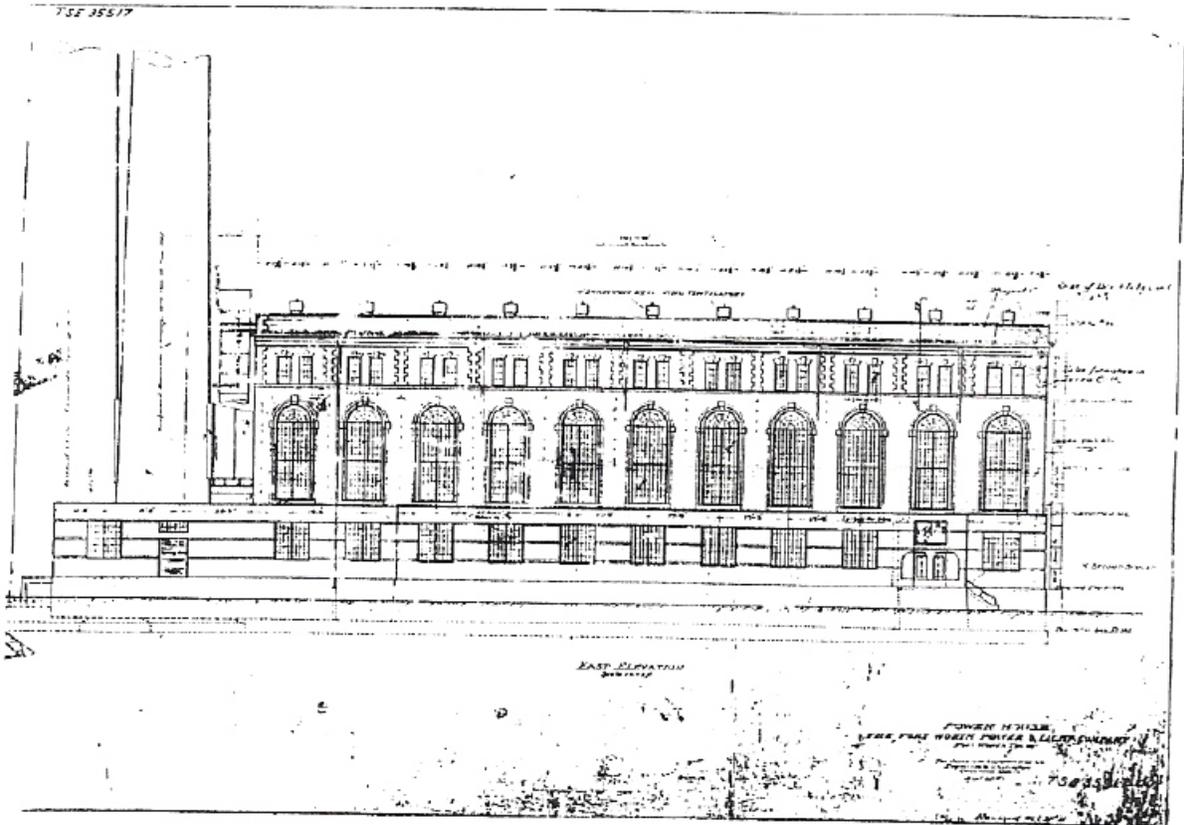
East Elevation, North Main Steam-Electric Generating Station, designed by the Cleveland Construction Company, September 22, 1911.
